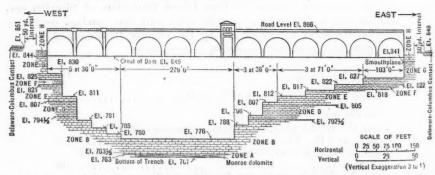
Cross-Section of the Scioto Valley at the Down-Stream Face of the O'Shaughnessy Dam.
